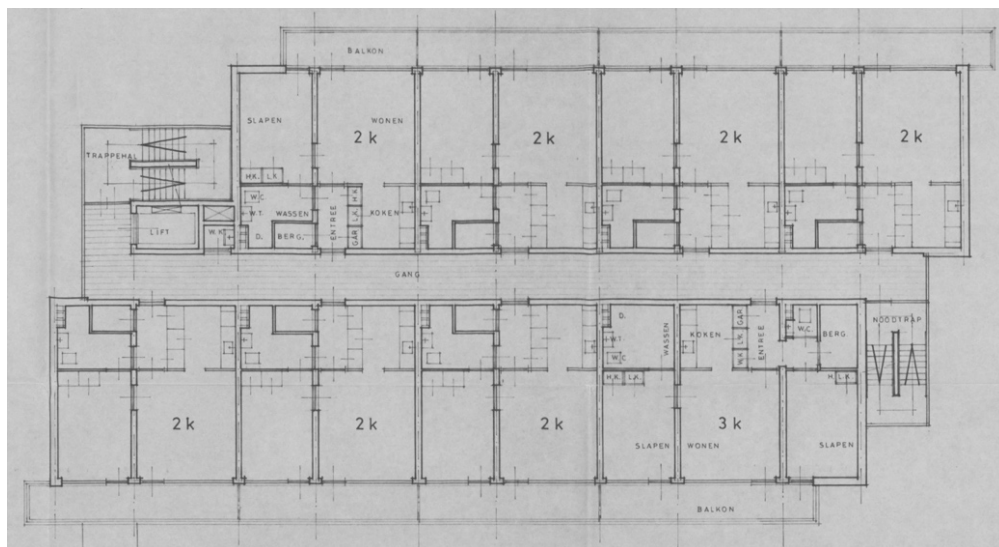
The floor plan of the apartment buildings (source: ARCHITEKTENBURO VAN DE KERKHOF).
